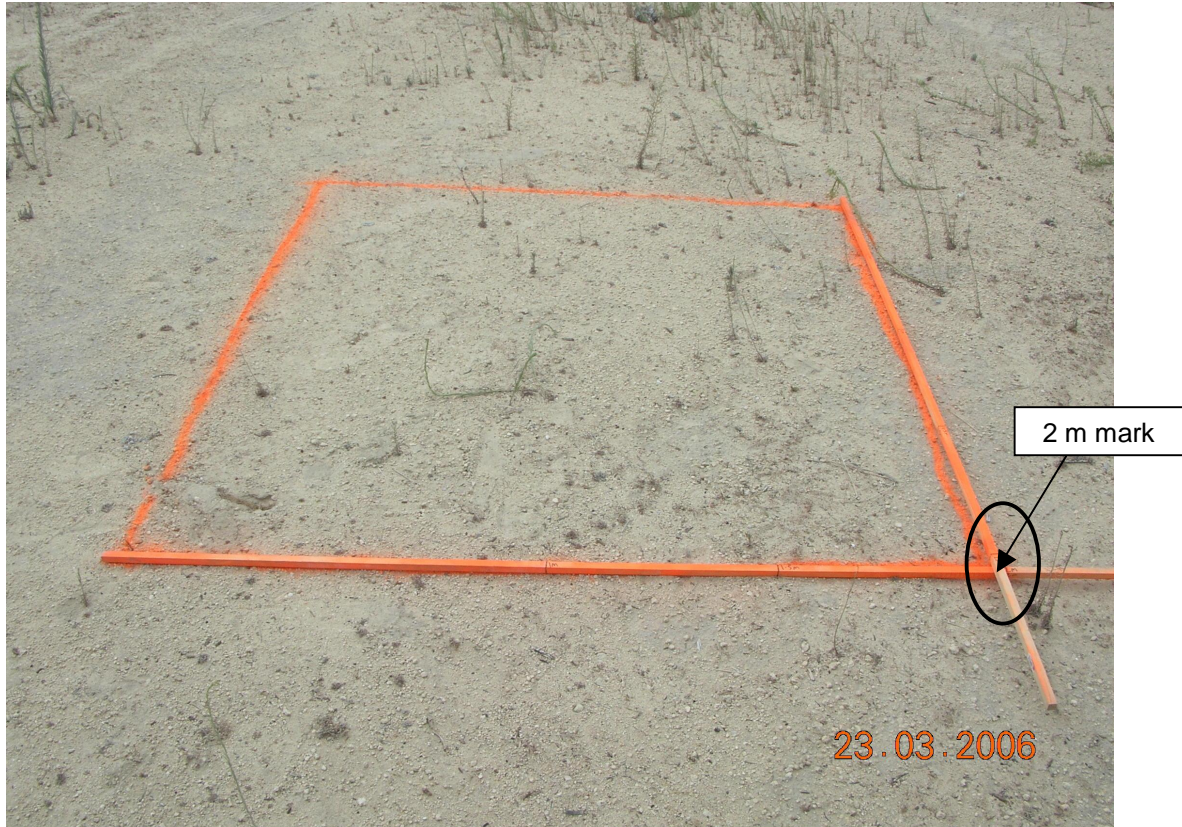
2 m x 2 m test pit marked-out for excavation by backhoe
